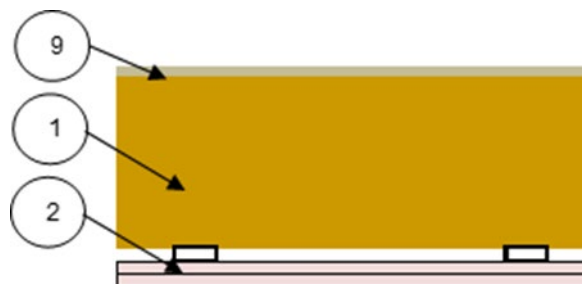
Timber framed floor ceiling system with fire grade lining fixed to furring channels that are suspended or clip fixed to the joist – Section view
